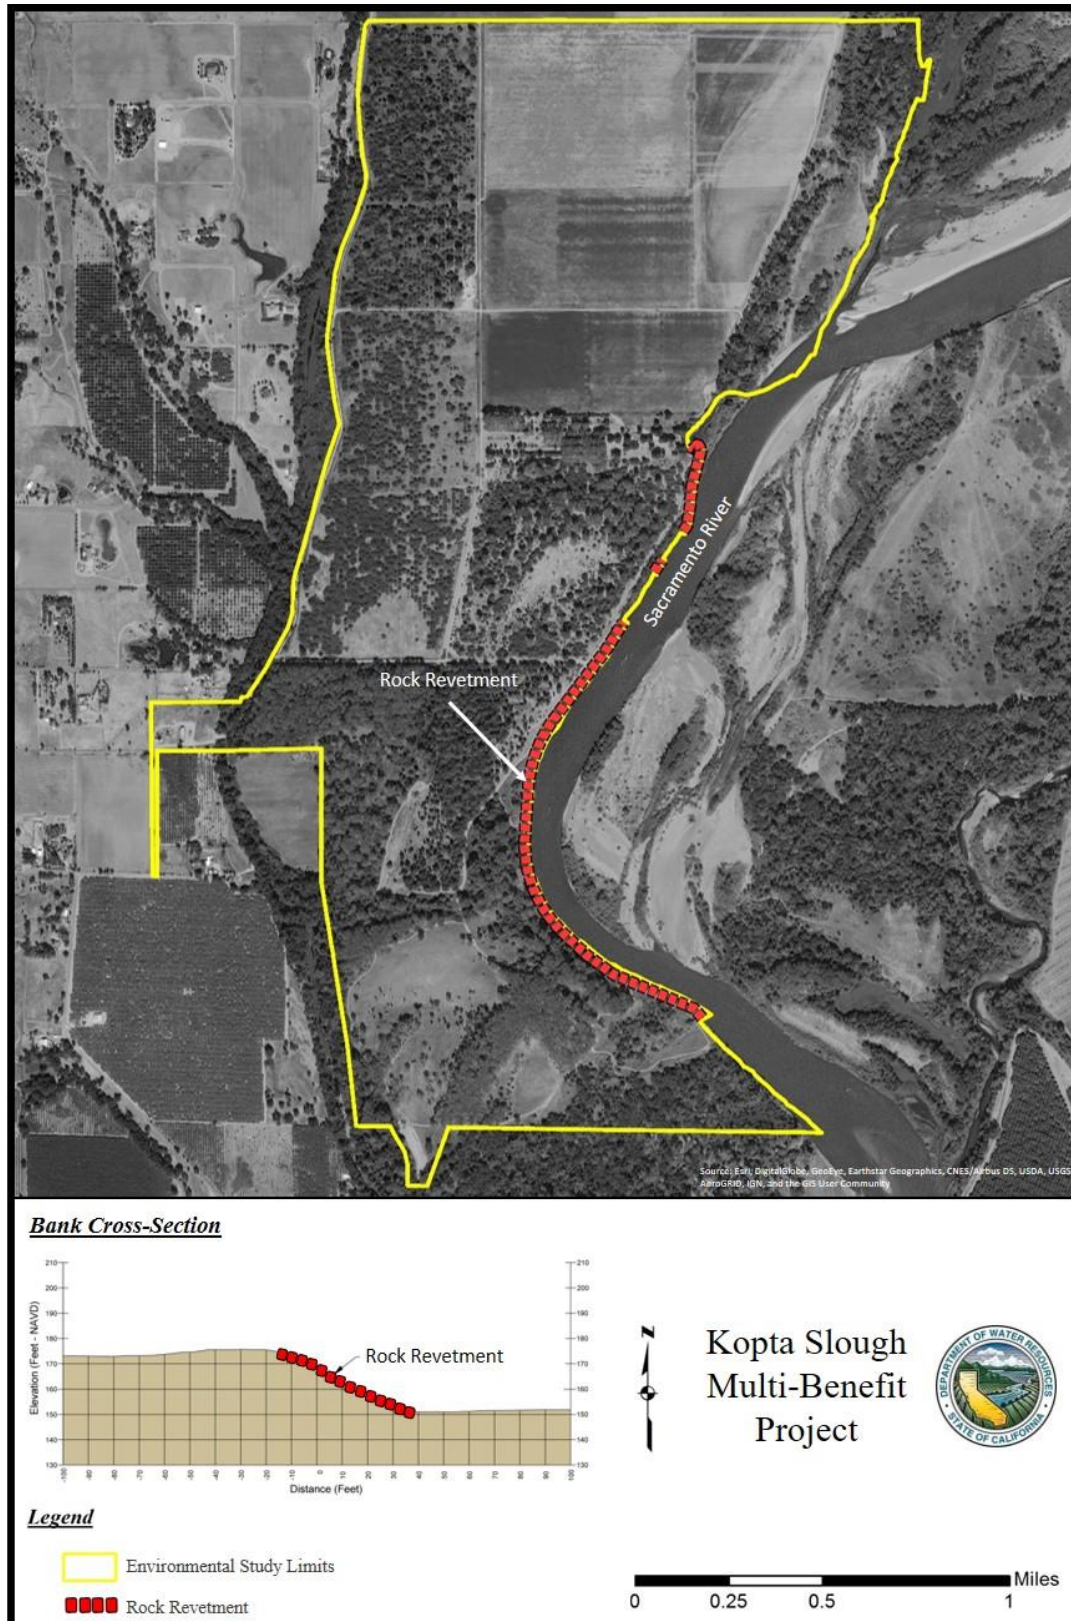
Plan and Cross-Section View of Proposed Rock Revetment Removal
